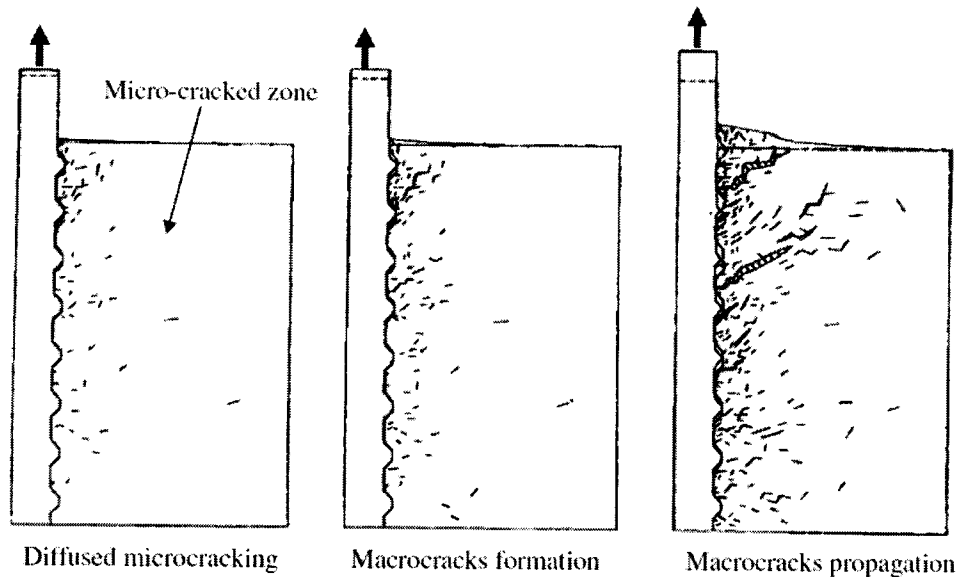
Damage build-up in concrete in the vicinity of a tensile reinforcing bar (reproduced from Ben Romdhane and Ulm, 2002).
